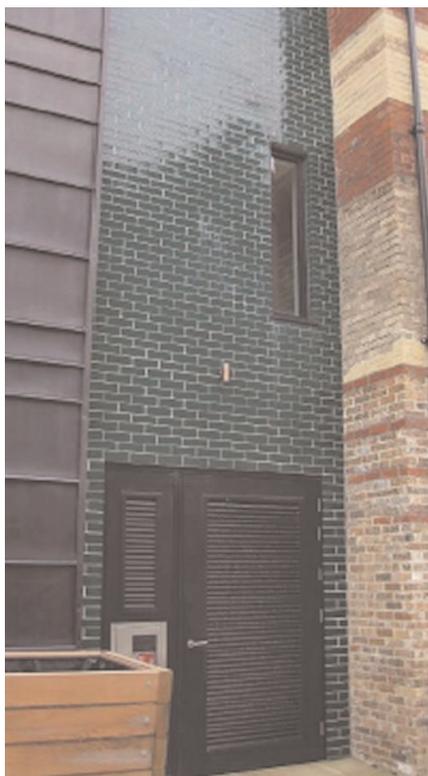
Tiled detailing from new build at the Eldridge Pope re-development scheme, Dorchester.
